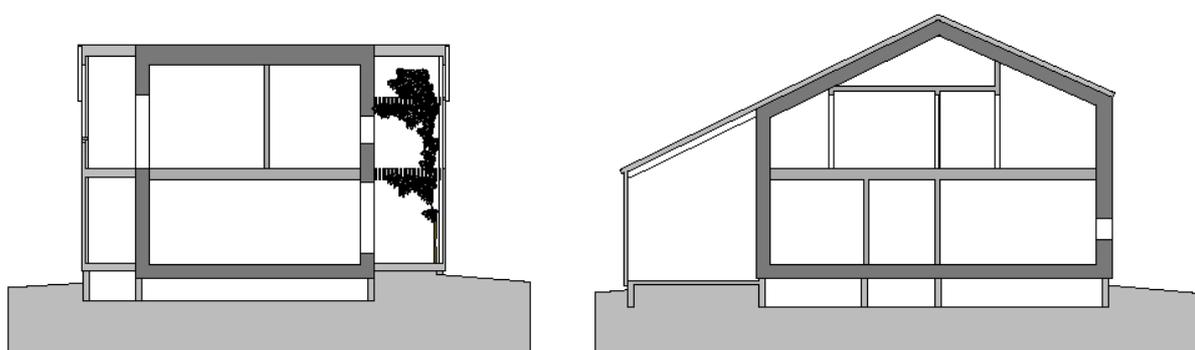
Building model for Bergen locality, with section A-A (left) and section B-B (right).
